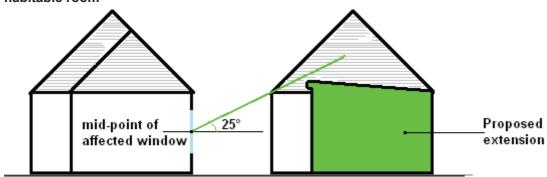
Fig B: Proposed extension would not result in loss of daylight to adjacent window of a habitable room
